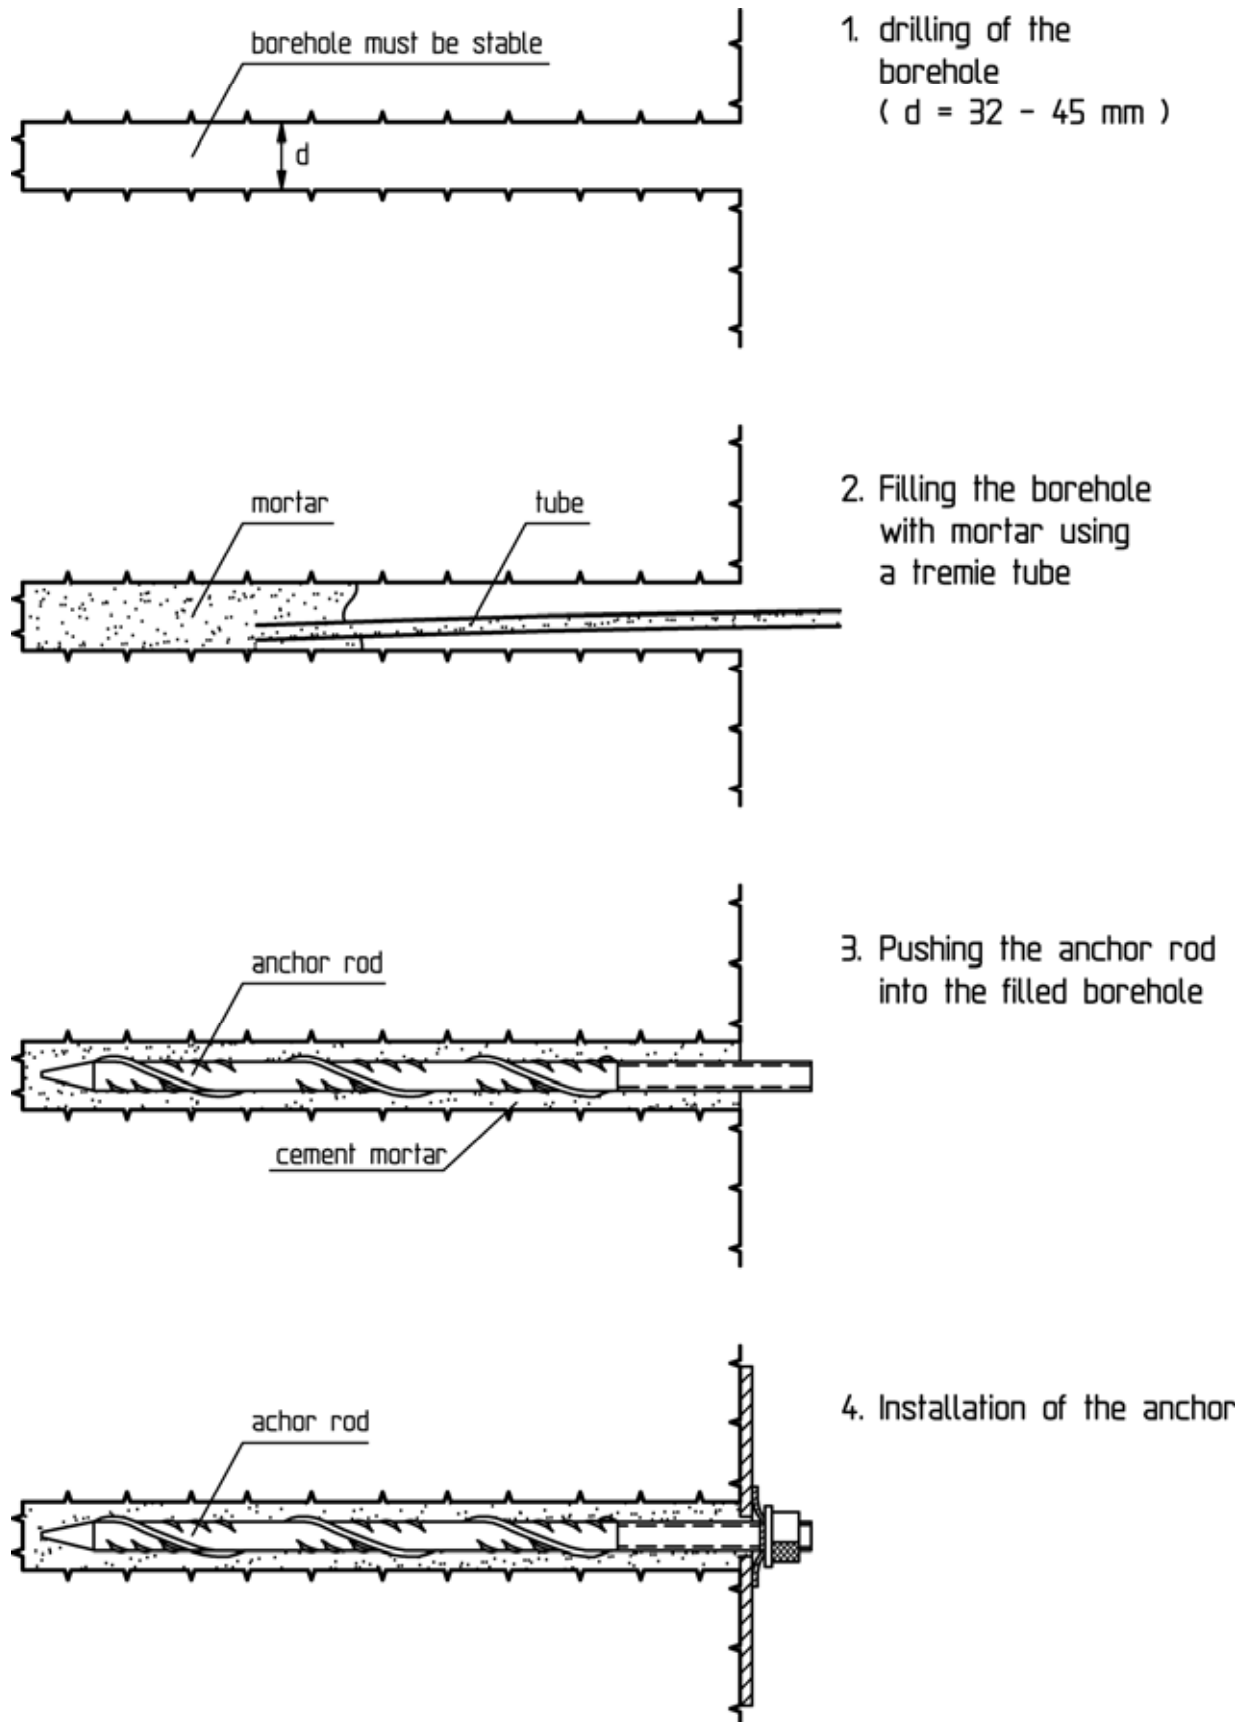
Installation of a mortar anchor (SN-anchor)
